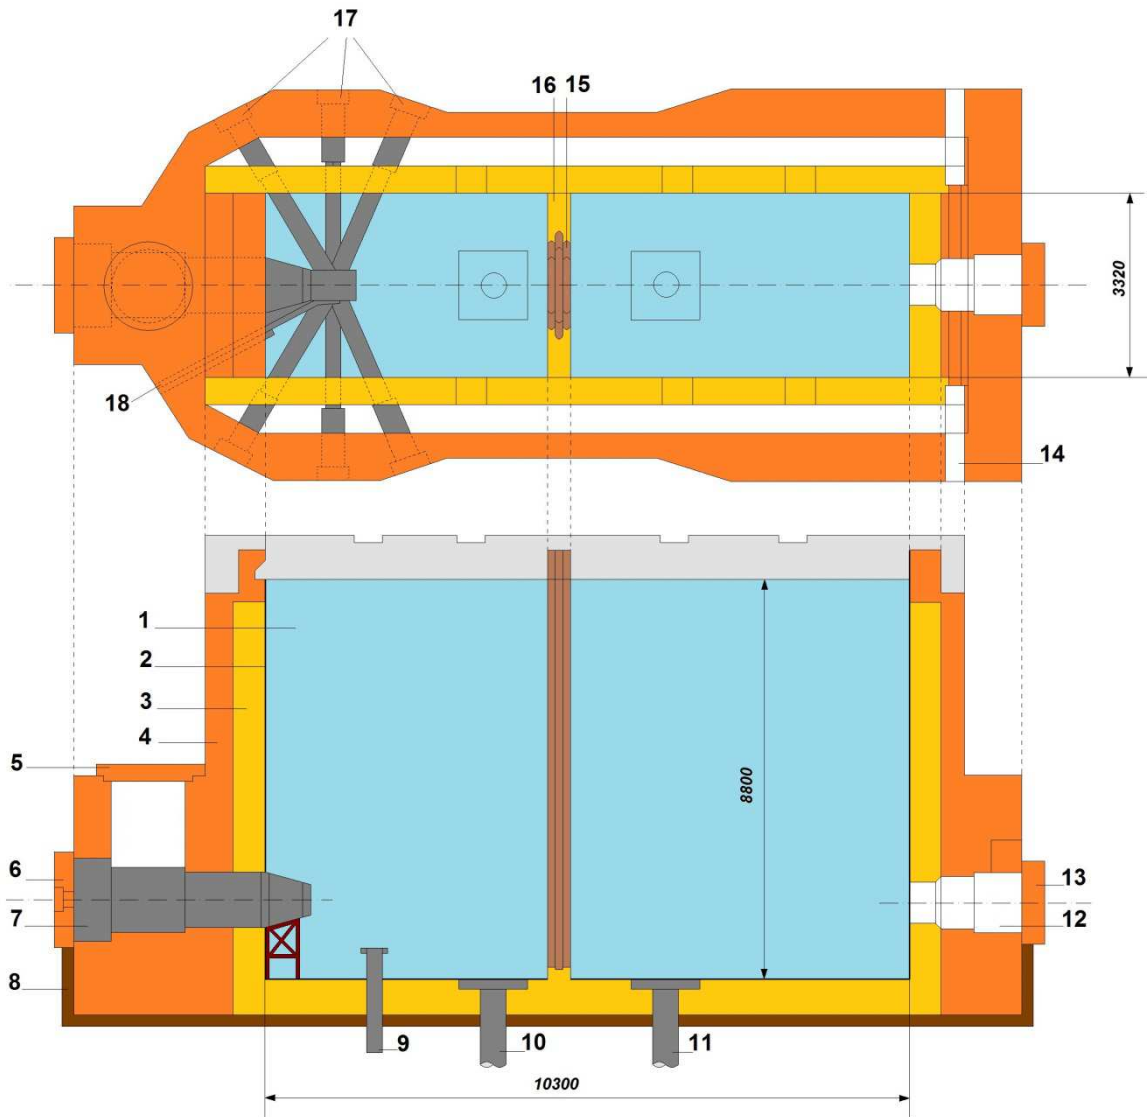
GRR-1 pool vertical and horizontal sections. 1. Demineralised water; 2. Stainless steel liner; 3. Pre-stressed concrete; 4. Barite concrete; 5. Top cover of the thermal column; 6. Thermal column door; 7. Graphite; 8. Lead Jacket; 9. Cooling water outlet; 10. &11. Cooling water inlet; 12. Dry irradiation chamber; 13. Dry irradiation chamber door; 14. Access part; 15. Aluminium gate; 16. Dividing wall; 17. Beam tubes; 18. Thermal column (Printed with permission from National Centre for Scientific Research "DEMOKRITOS").
